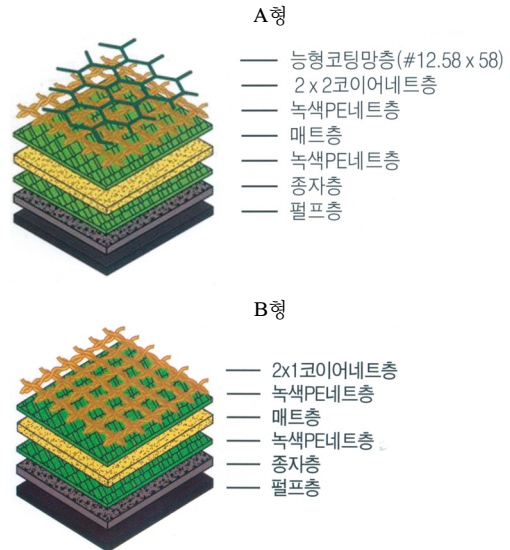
Cross section of vegetation mat installation (Unit:m)
